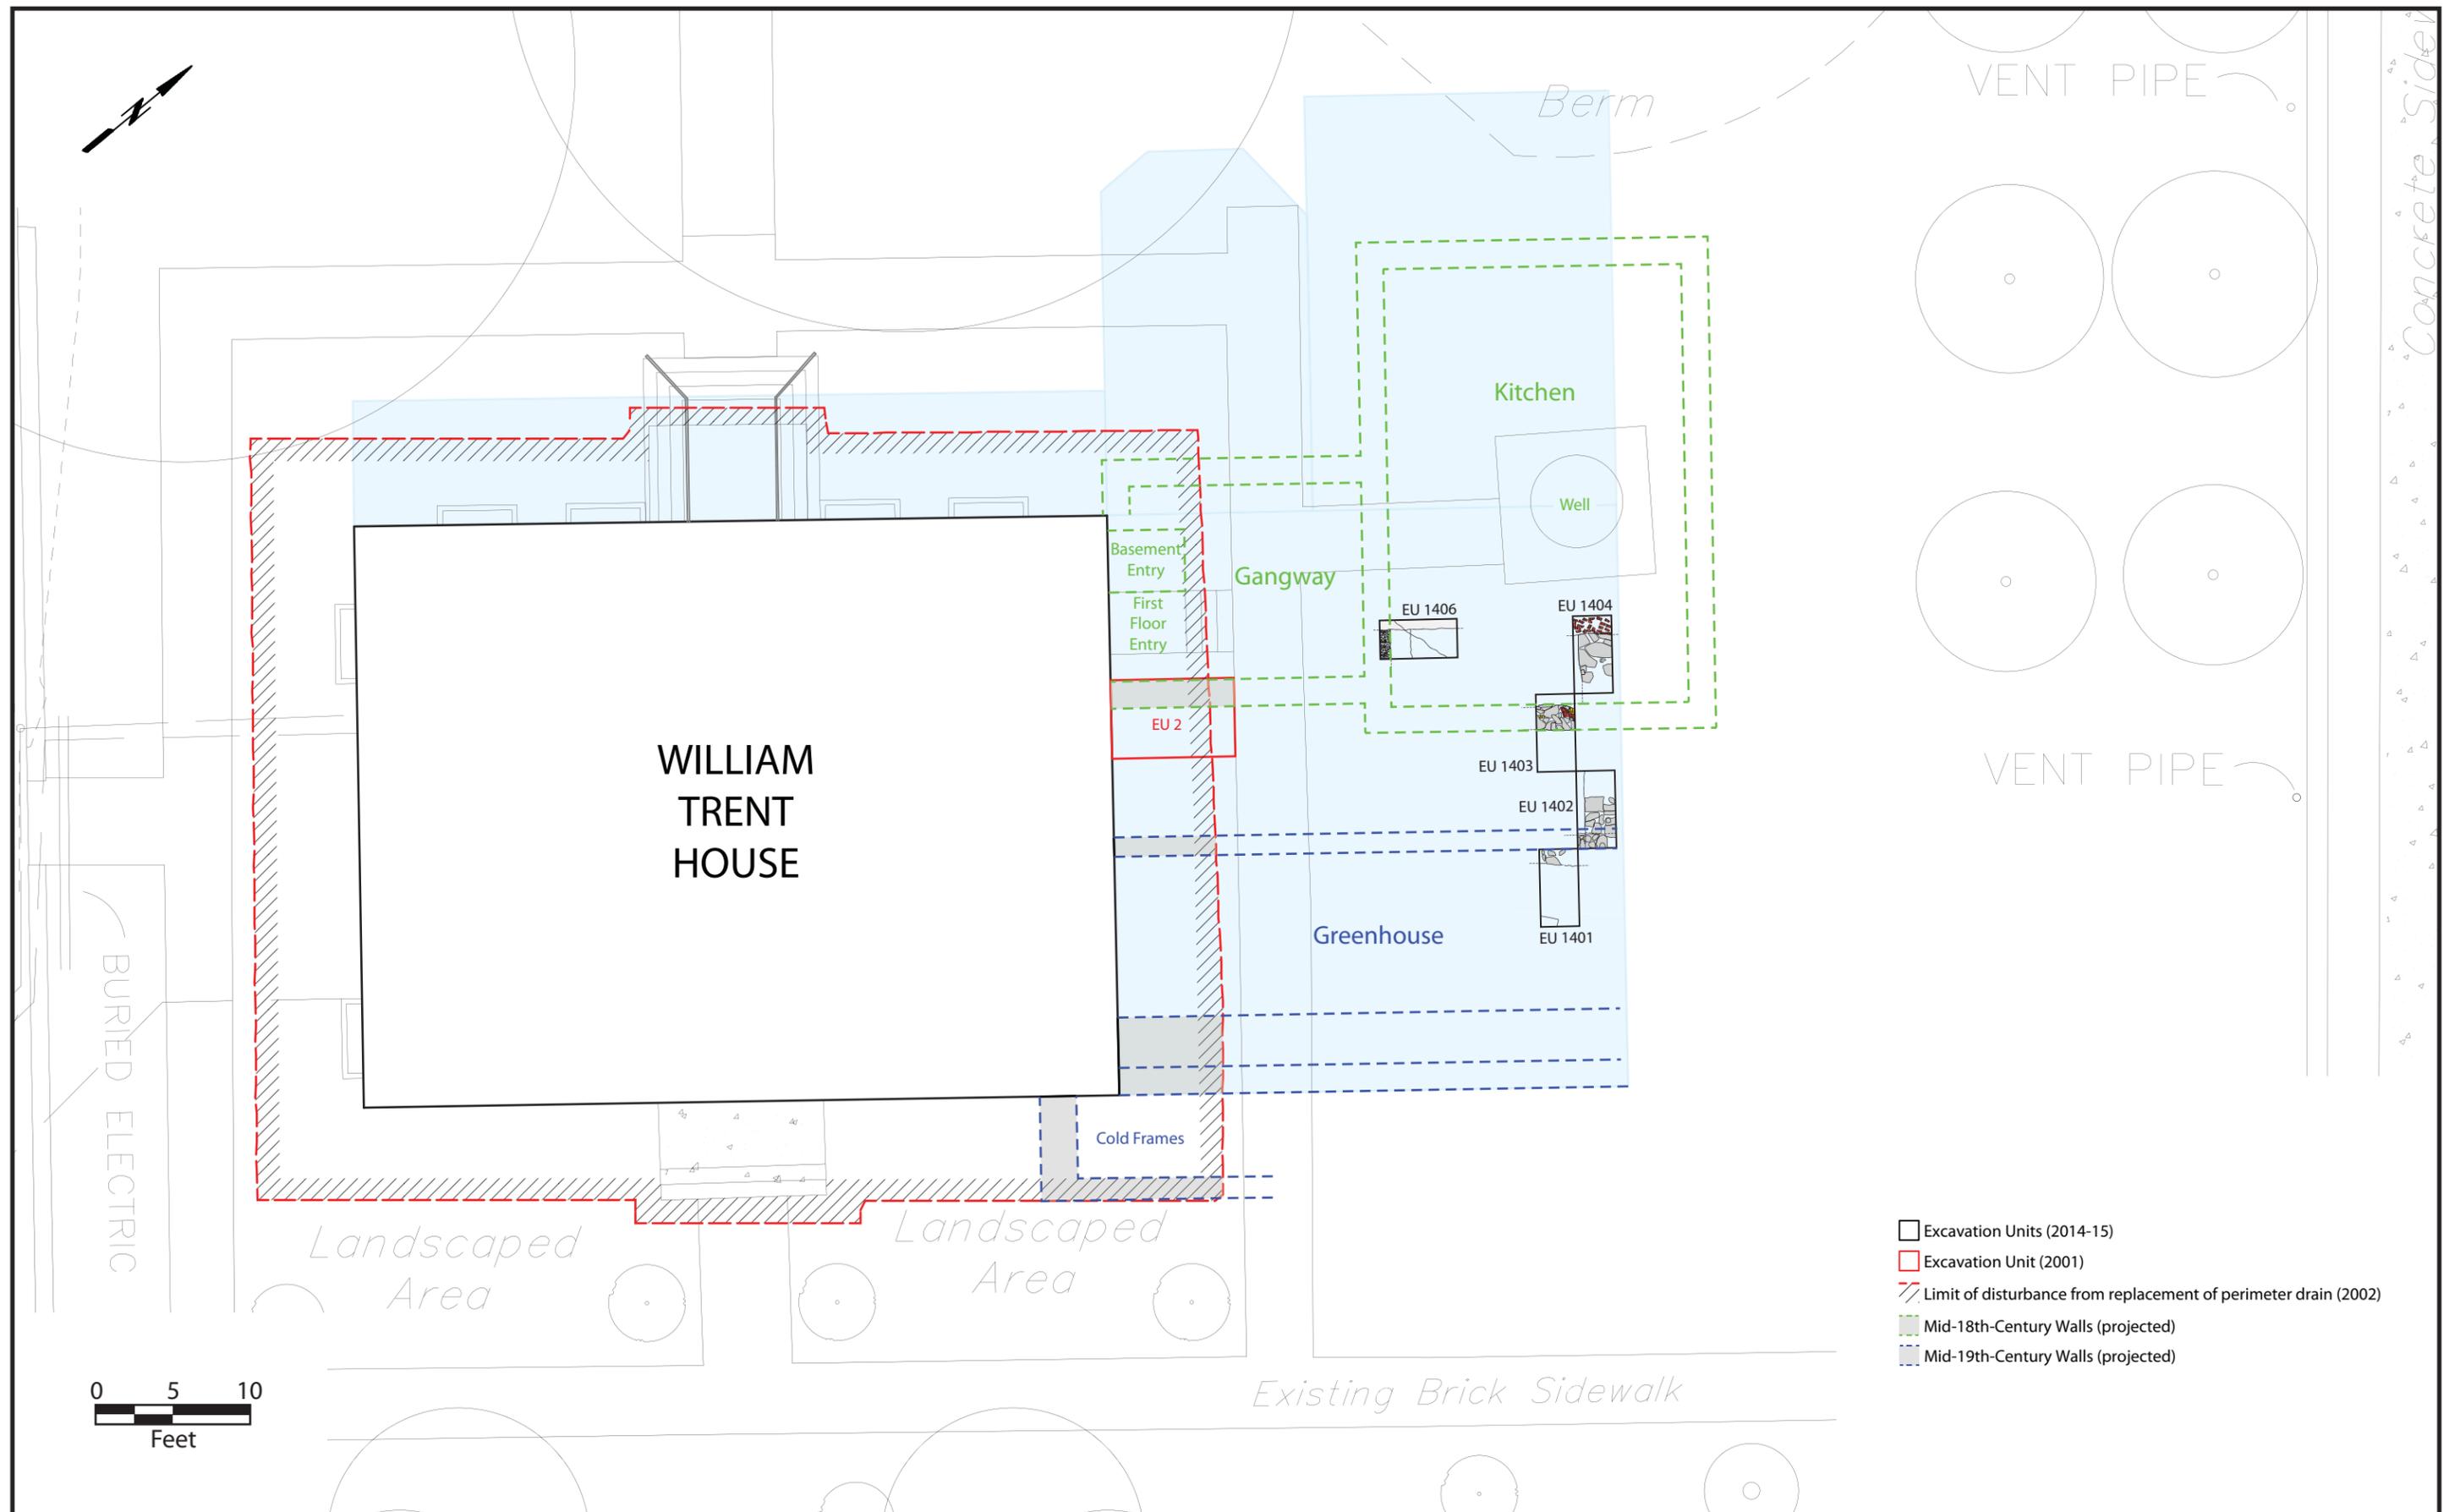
Conjectural Site Plan, Mid-18th-Century Kitchen Wing and Gangway, and Mid-19th-Century East Wing of House.
